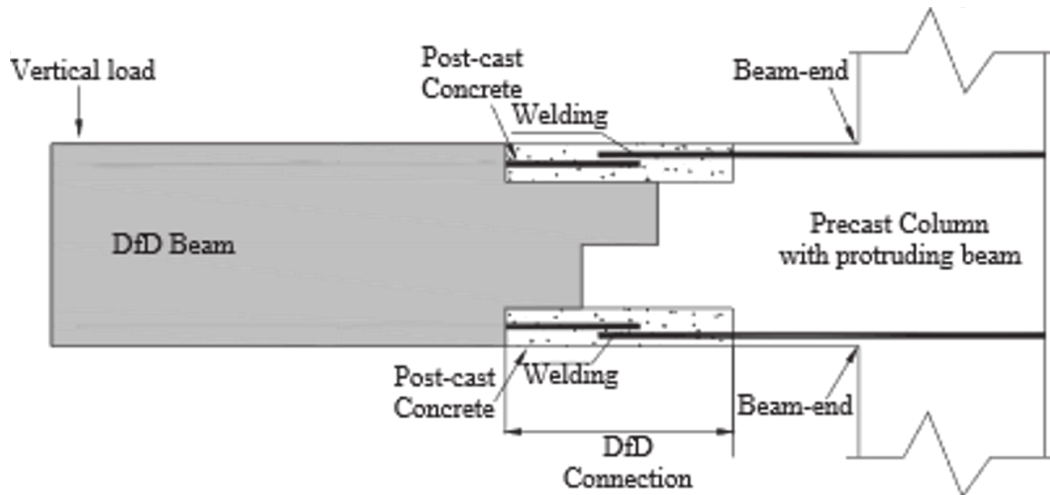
Moment-resisting semi-dry connection, with welded continuity reinforcement, between a beam and a column of a precast reinforced concrete structure. Reprinted from Xiao et al. [27].
